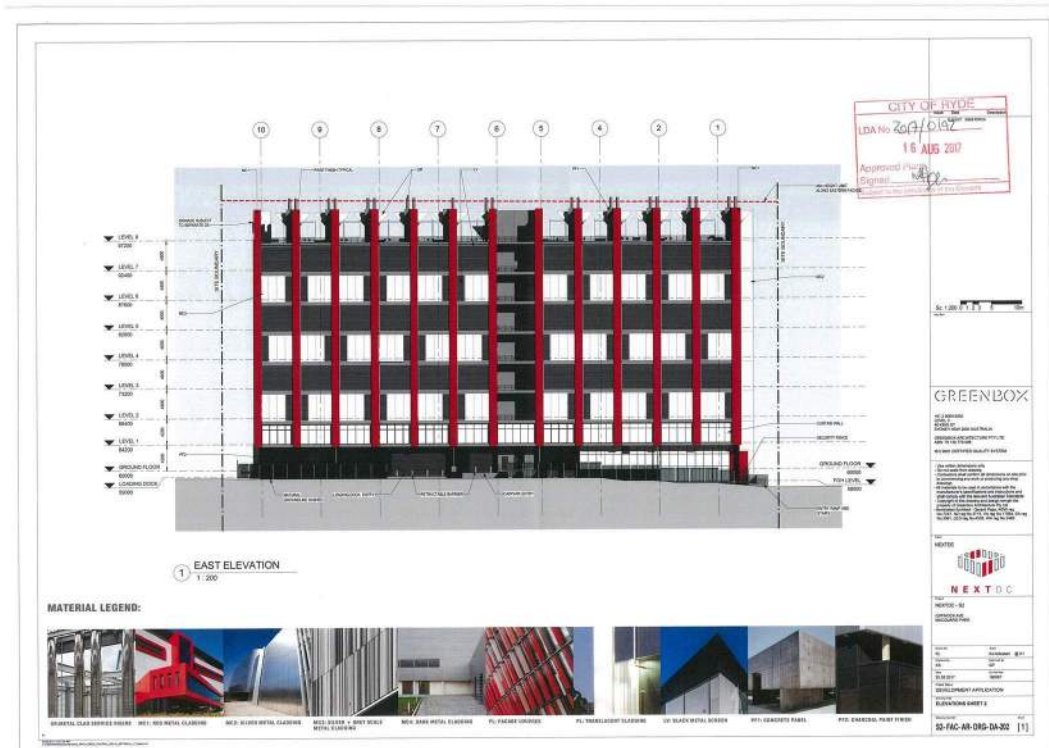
NEXT DC2 - East Elevation (Source: GIPA)
